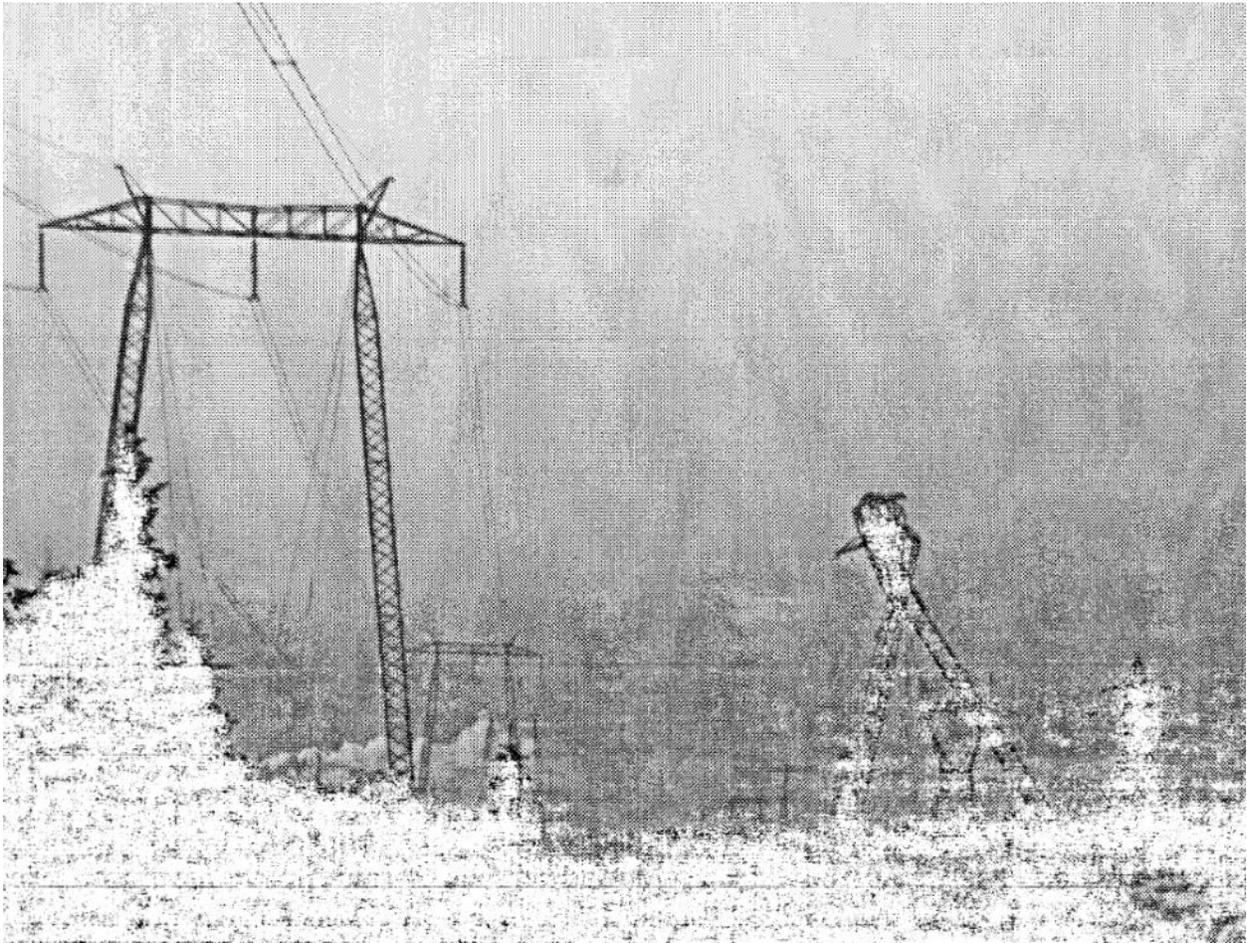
Damaged Tower Type A 301 (right side). Undamaged Tower Type A (left side)
